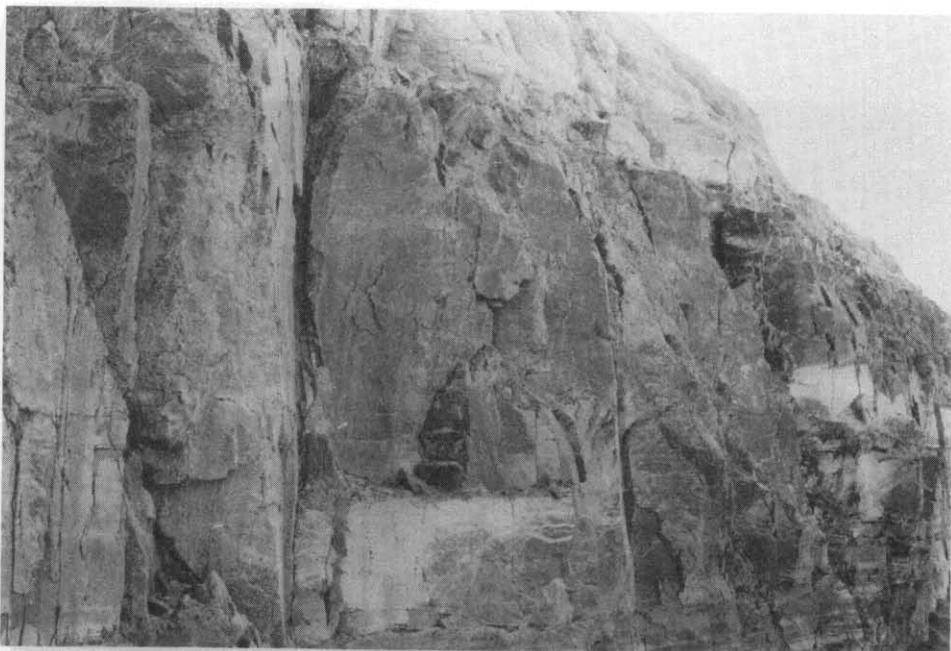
Tunnel Hill cutting. Opening of vertical joints.
